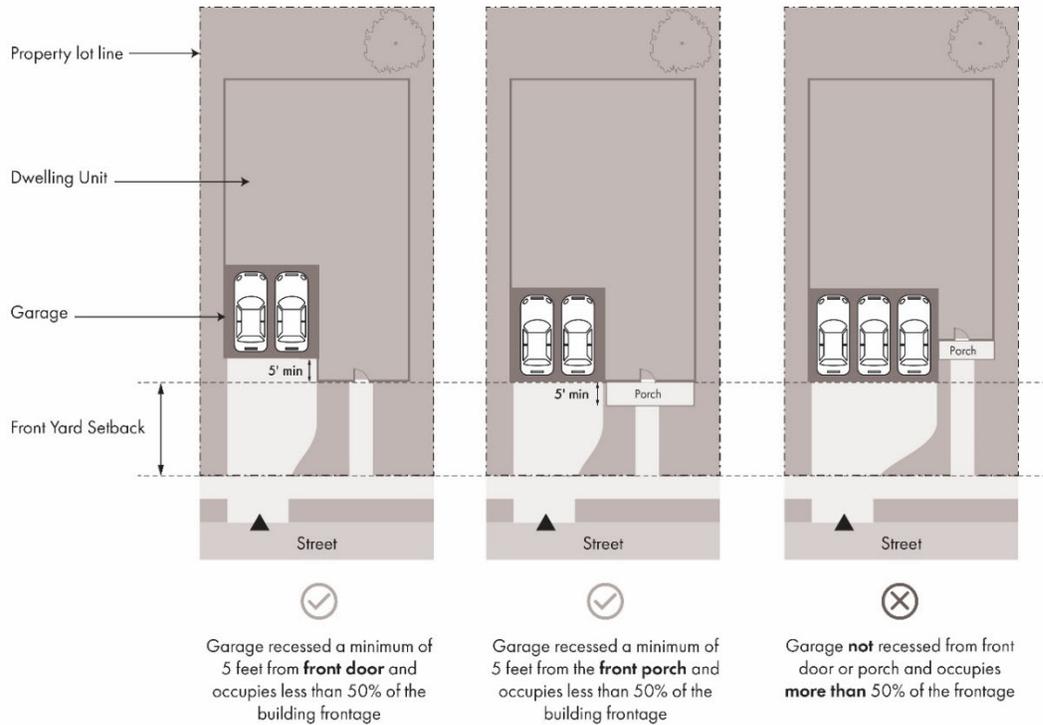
H: If a garage door faces the street, the front plane of the garage shall be setback from the front porch or patio and occupy no more than 50% of the building frontage.
